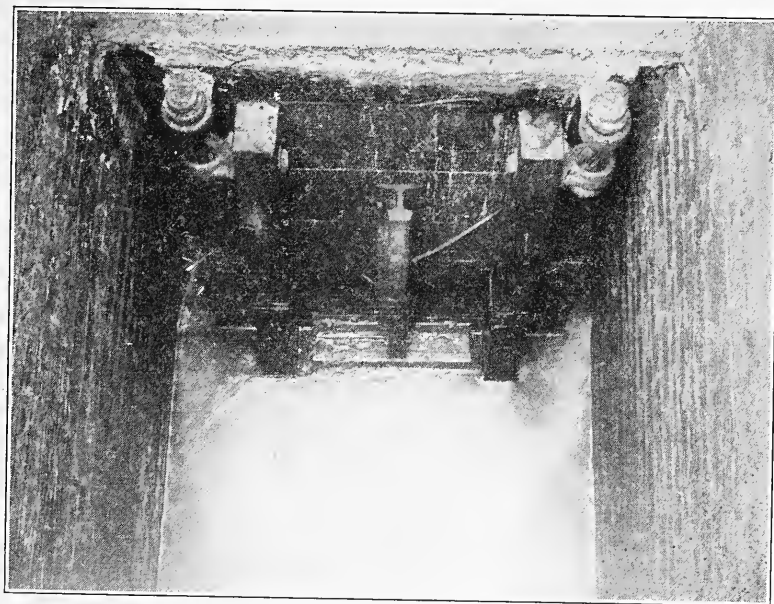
This picture was taken looking downward into manhole to show the tide gate and specially designed hinges. Milford.
